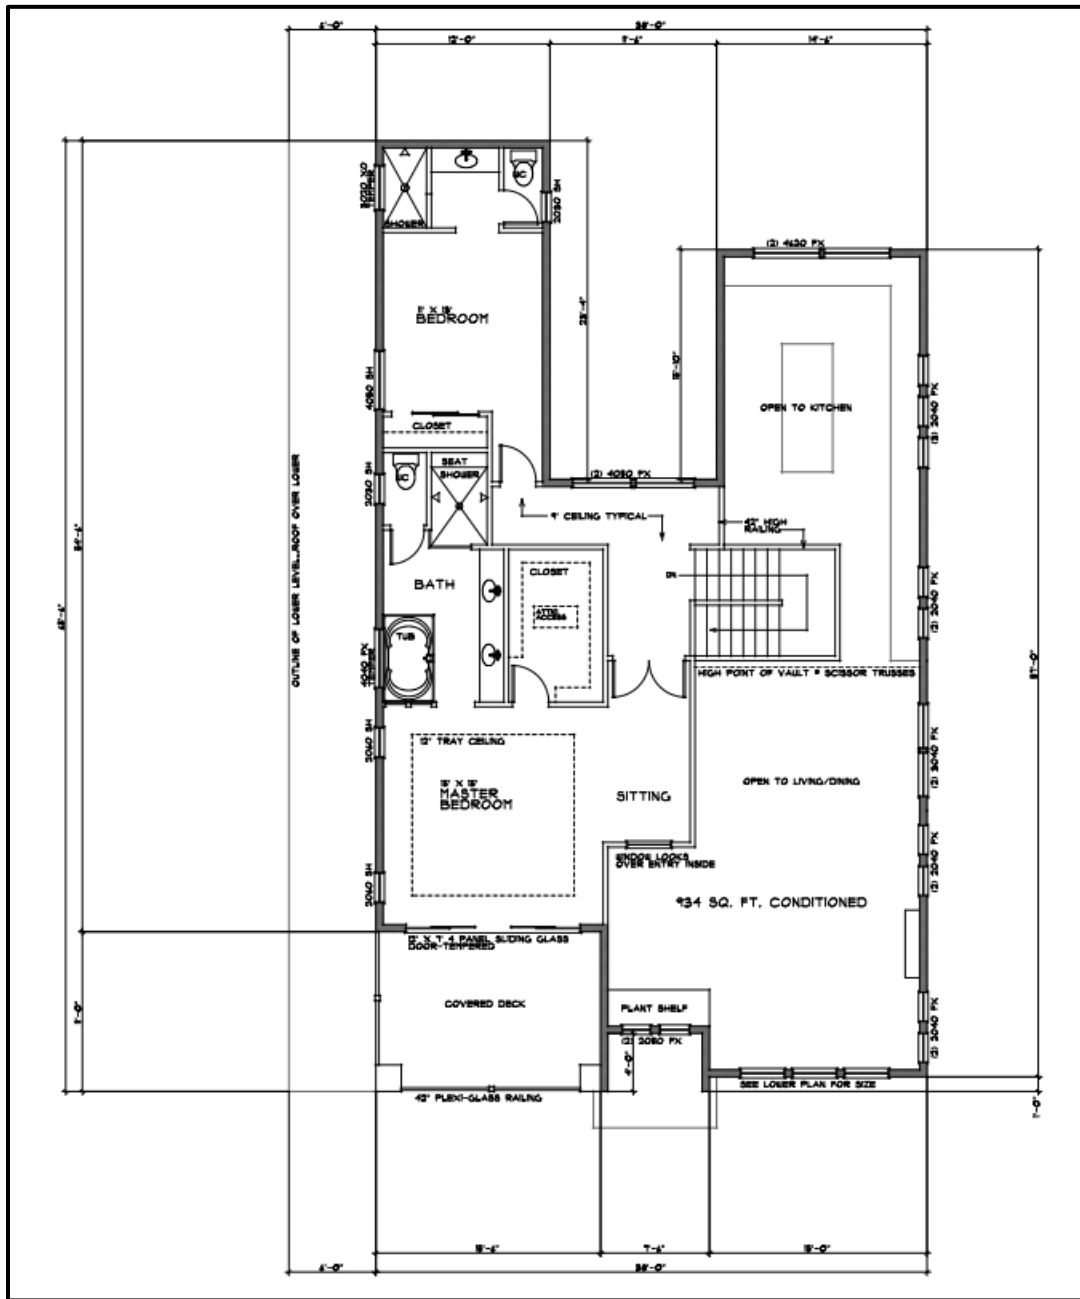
Proposed New Floor Plan, 2nd Floor (Sheet A-2.2 Attachment B)
